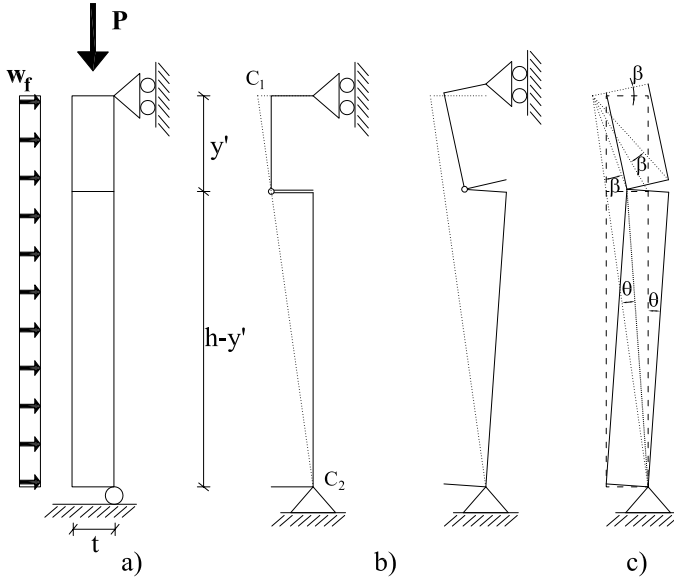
Mechanism at failure for a rammed earth wall: a) boundary conditions; b) possible deformed configuration of a wall modeled as made of 2 beams; c) angles of rotation around C_1 and C_2 .
